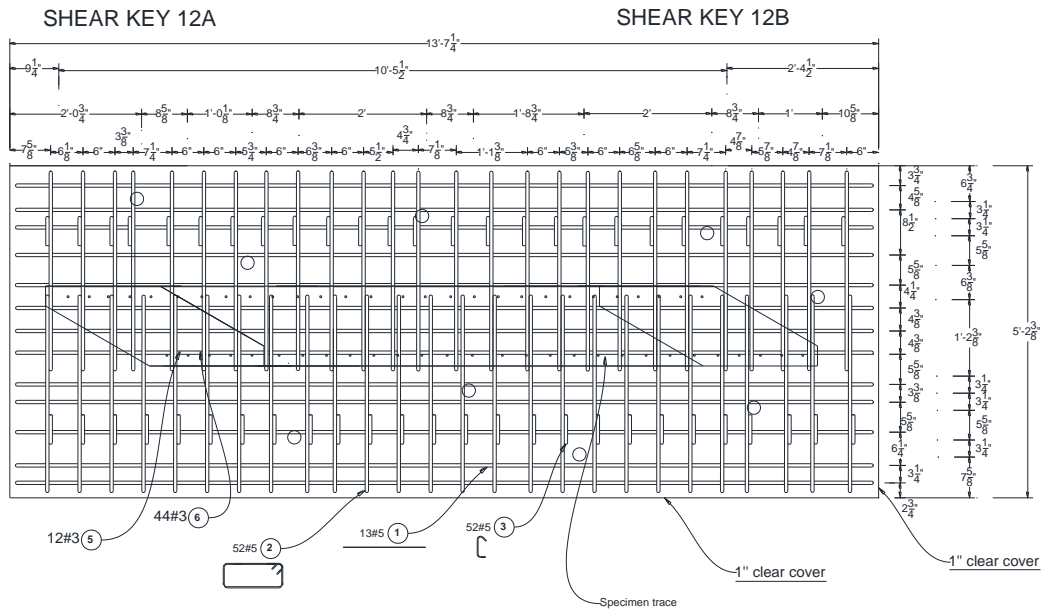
Section D-D in design drawings for Specimen 12 (see Figure 8.2 the location of the section)
